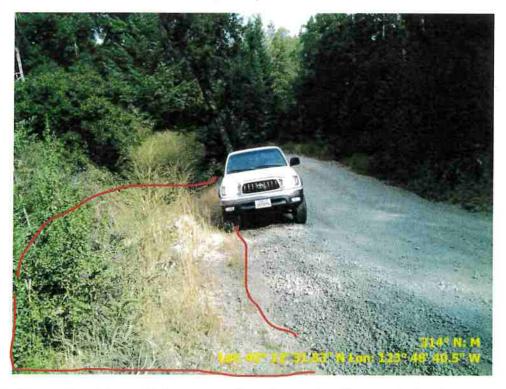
Photo of Road Point 67 showing a pullout that needs to be regraded and vegetation cleared.
